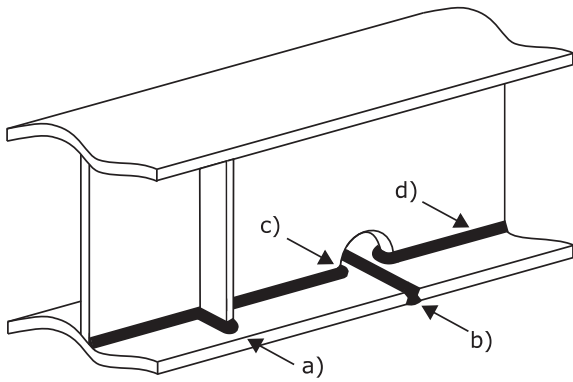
Typical weldments in bridges; a) non-load-carrying transverse attachment, b) butt weld, c) cope hole and d) longitudinal flange-to-web weld.
